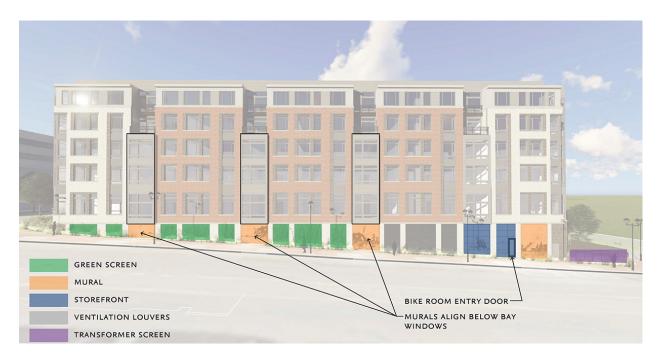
Illustrative Elevation of the Proposed Building as seen from Marinelli Road, highlighting façade activation strategies
